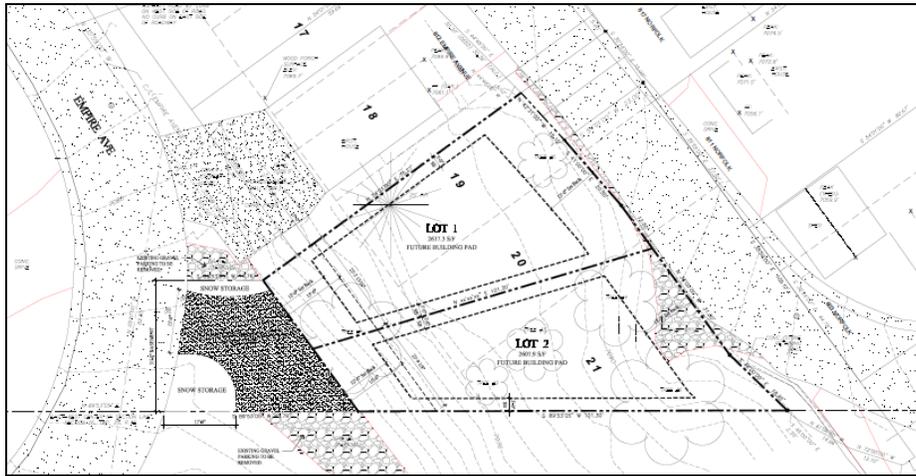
Proposed Driveway from Built Empire Avenue over Platted-Unbuilt Empire Avenue to Lot 1 and Lot 2
